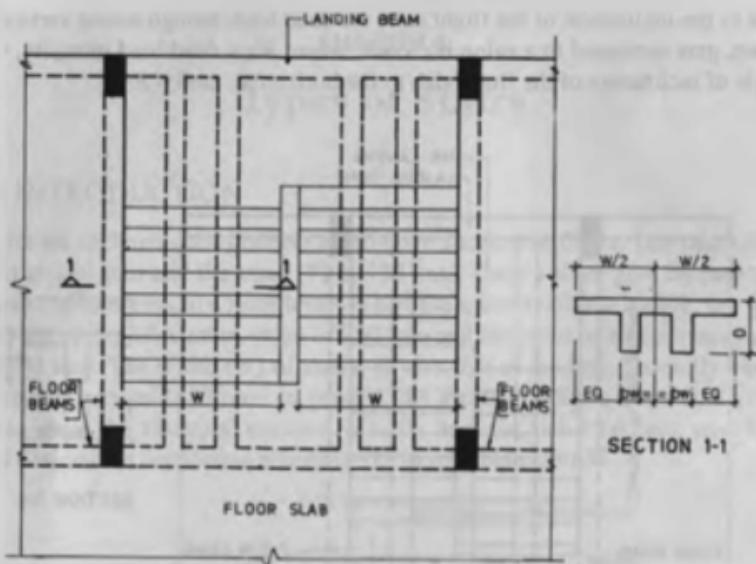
Plan of wide flights stairs with two central beams in each flight.
